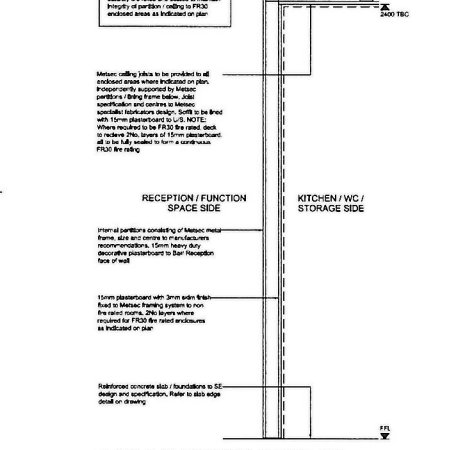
GENERAL ARRANGEMENT SECTION - 1:50
